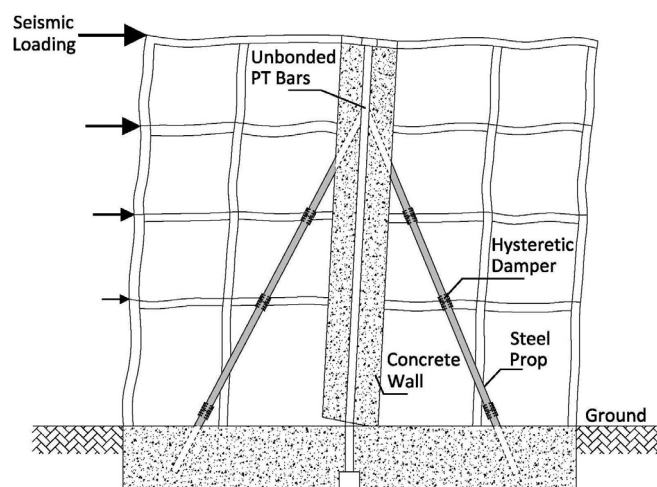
General layout and deformed shape of a propped rocking wall.
